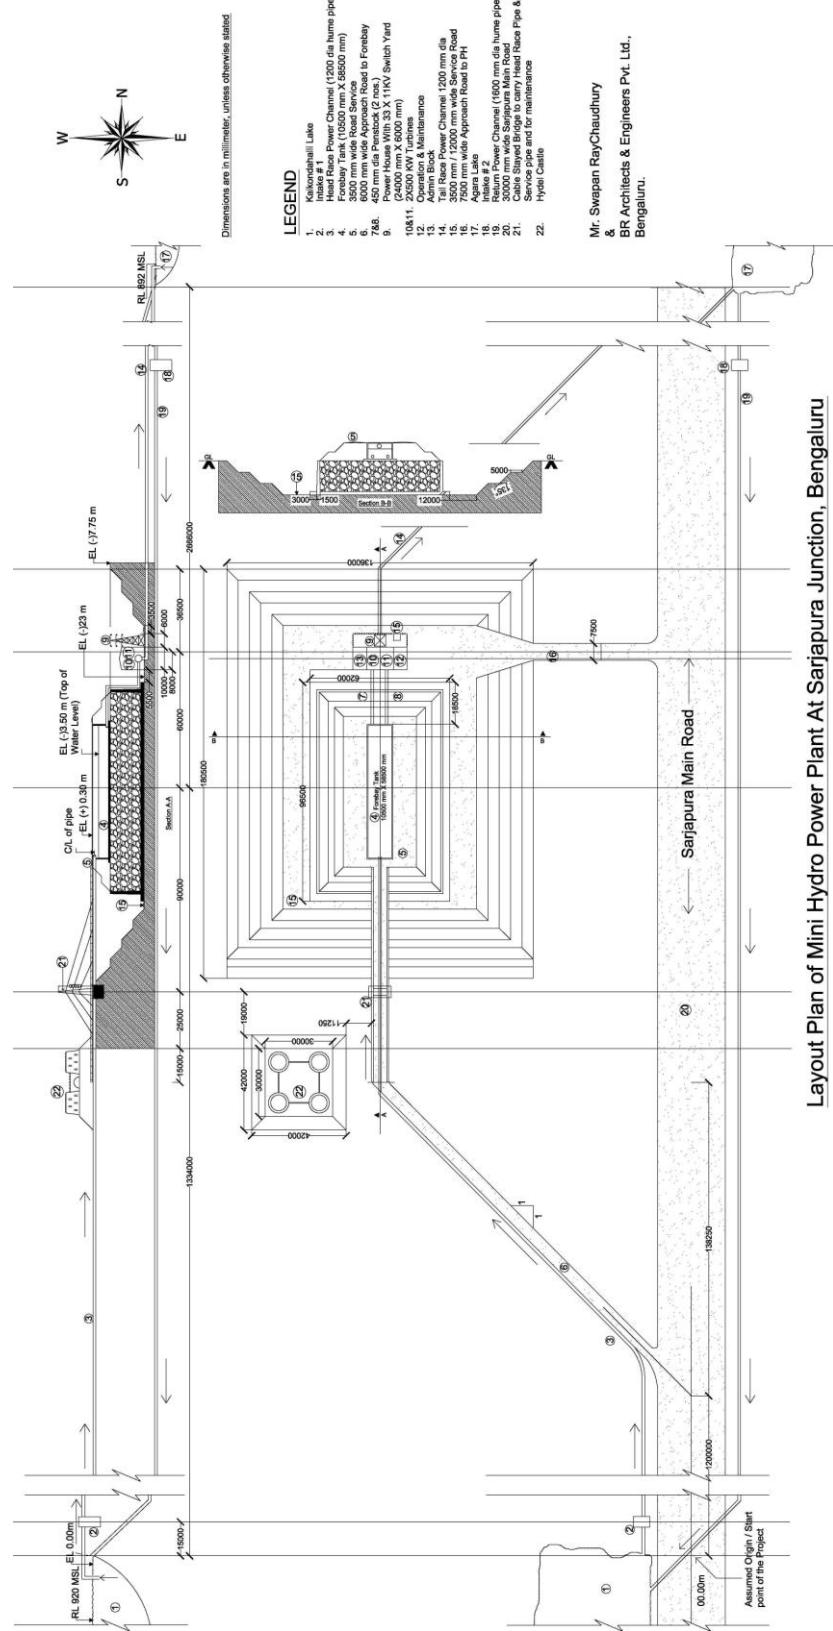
Overall Layout of the proposed Mini Hydro Power Plant
